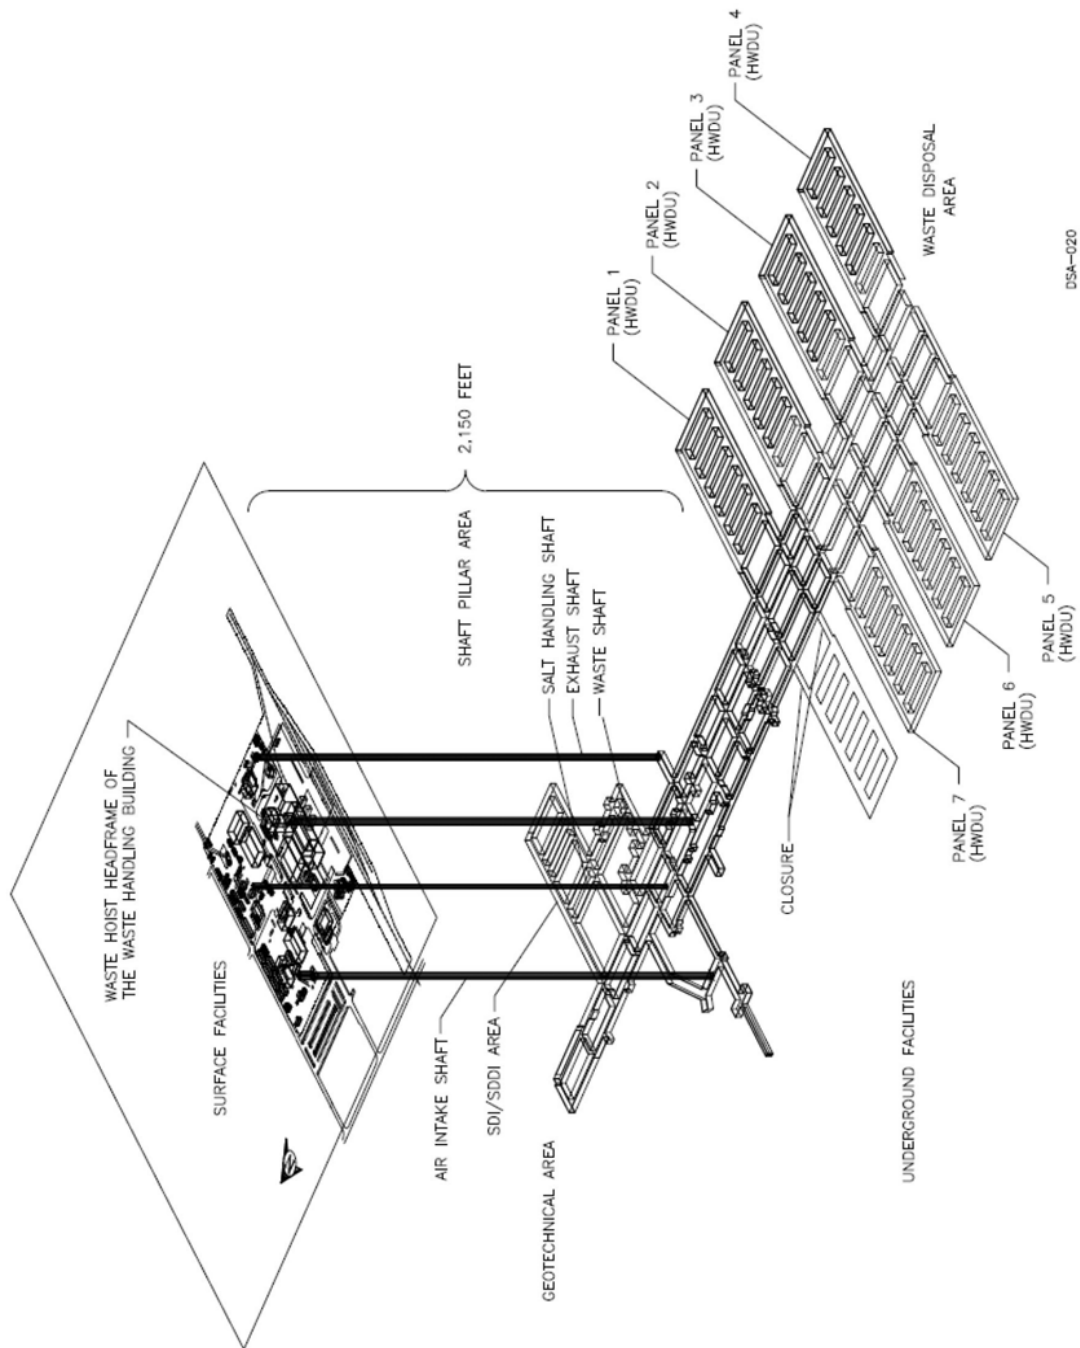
Spatial View of the WIPP Underground Facilities
